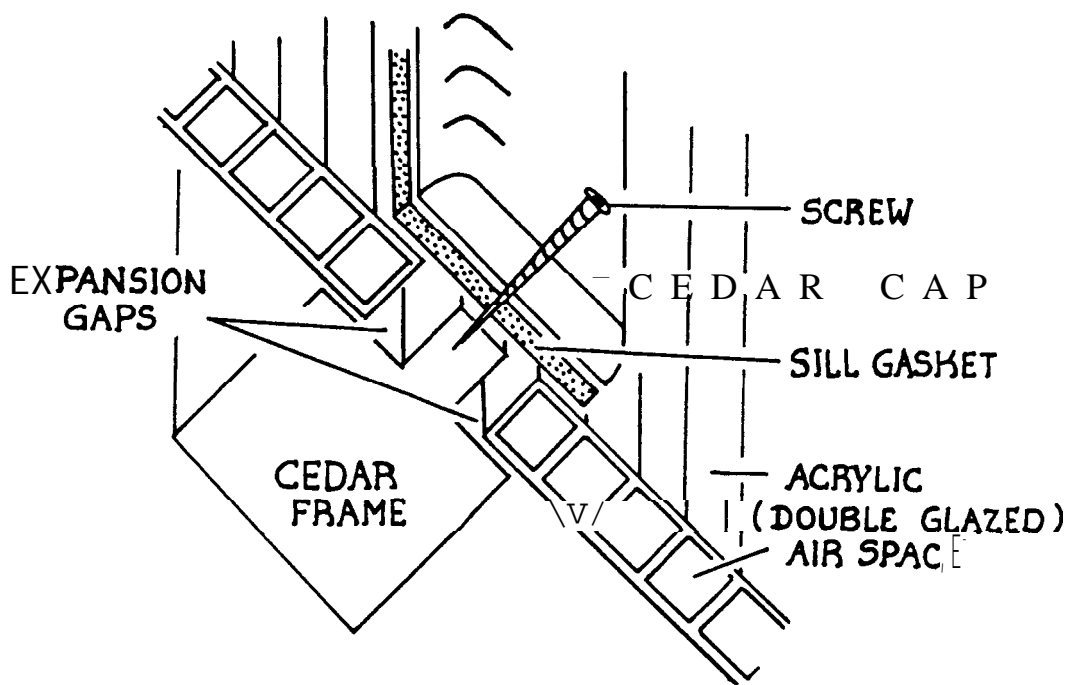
Cross-sectional detail of acrylic glazing and cedar cap assembly.
